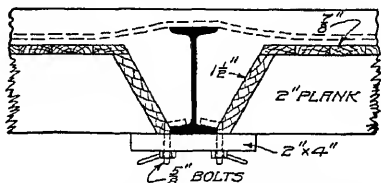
Forms for Reinforced Concrete Slab between I-Beams
